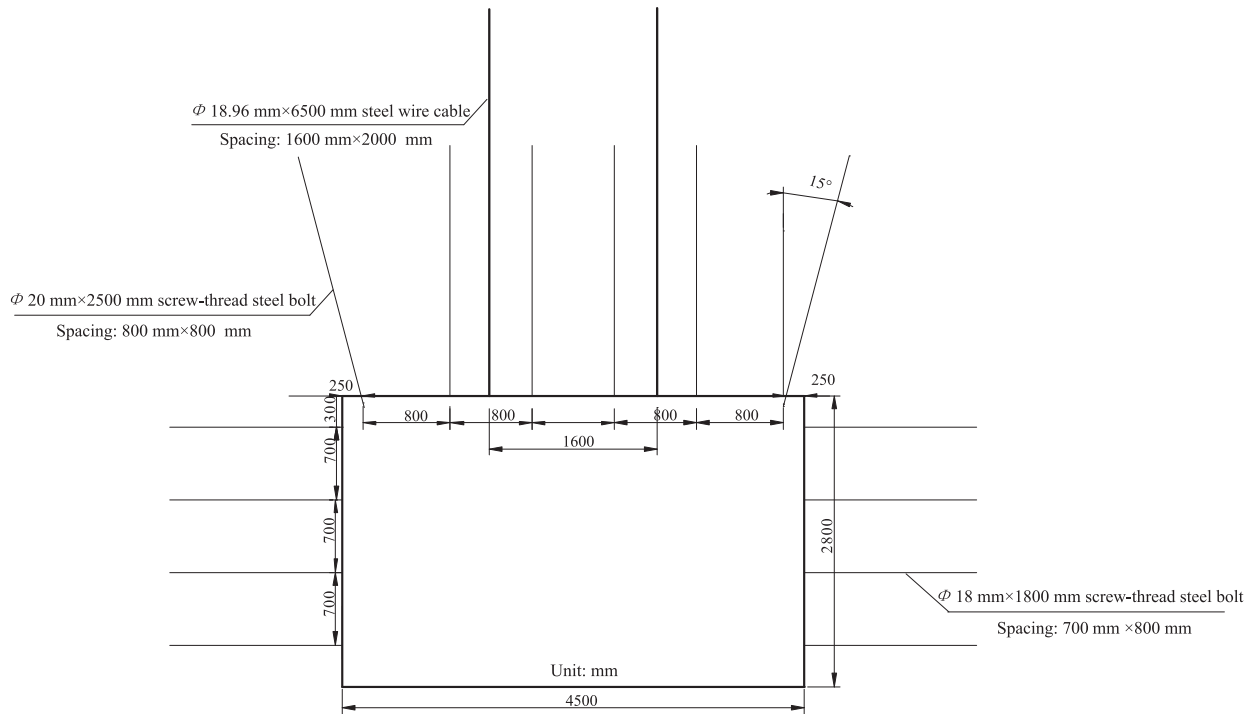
Layout of the original support design of haulage roadway of longwall panel #14-1103.
